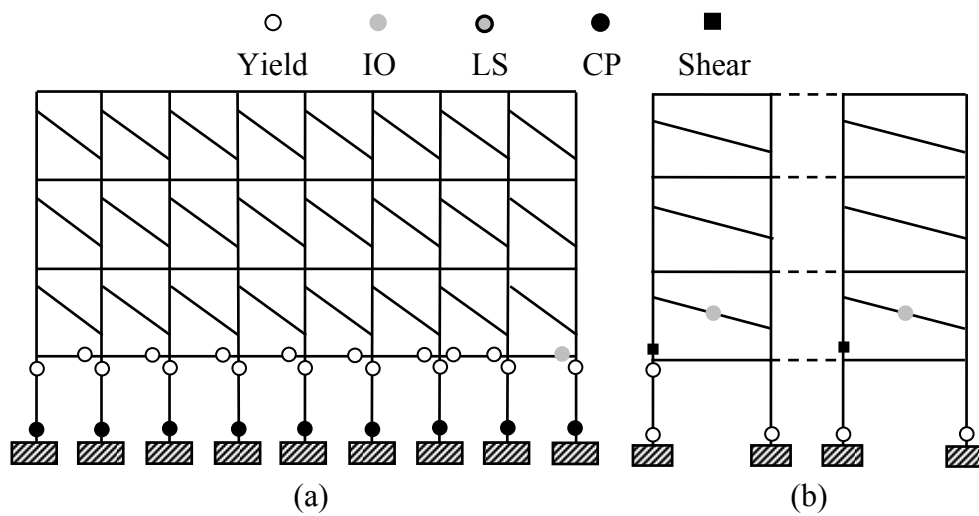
Collapse mechanism of four storey infilled RC frame building with open ground storey, designed for gravity loads alone as per relevant Indian Standards: (a) typical longitudinal frame; (b) typical transverse frame.
